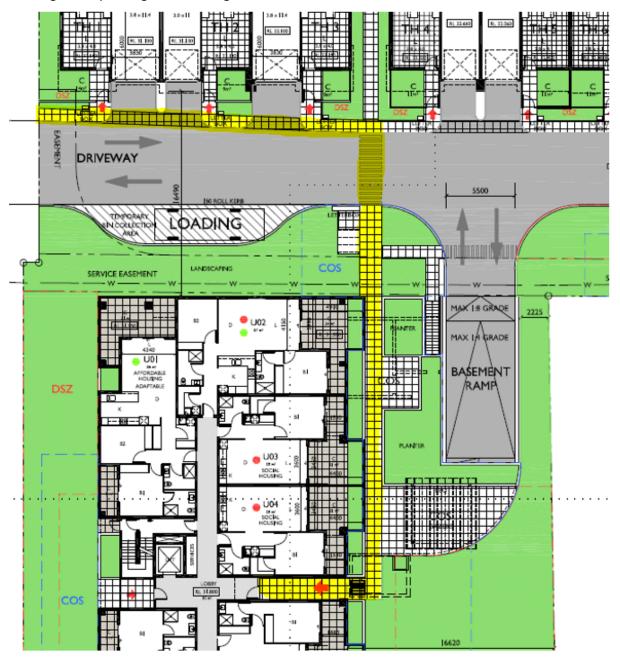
Inset of ground floor of RFB highlighted path from street frontage
